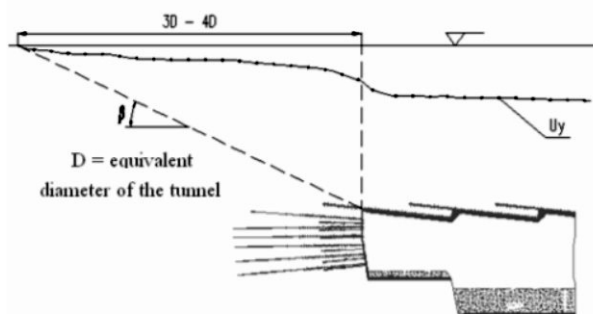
Angle of influence and deformations on the surface due to tunnel excavation
